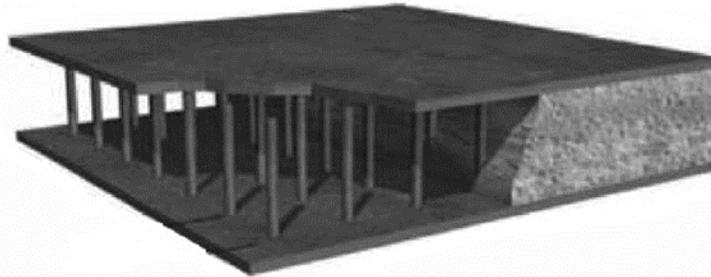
Steel concrete steel panel, figure from Liew and Wang (2011)
